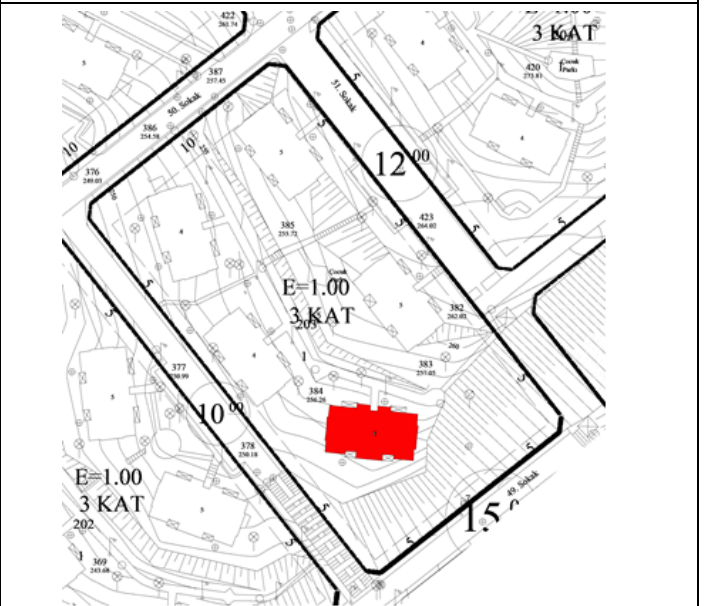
Type-2.2 The building was placed on the 203th island at 254 m elevation in northwest-southeast direction. The residence area is approximately 465 m<sup>2</sup>. It consists of four floors and 14 apartments in total.
